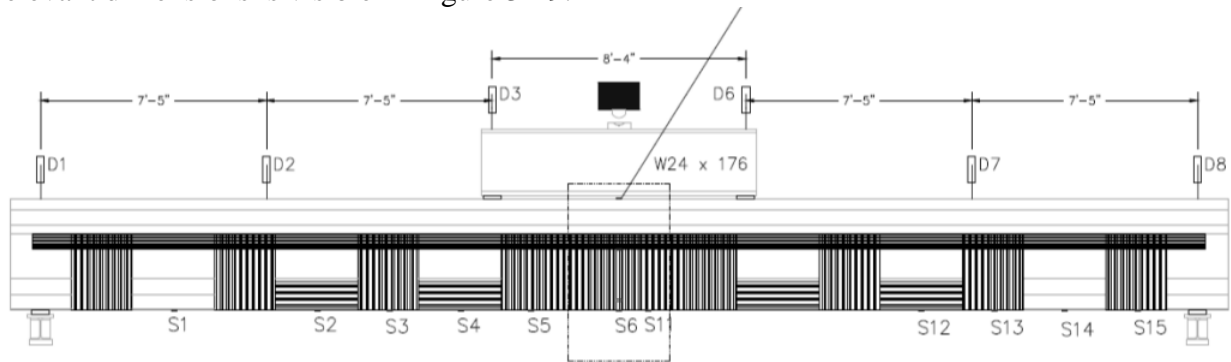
Static loading setup arrangement for all RC test specimens
